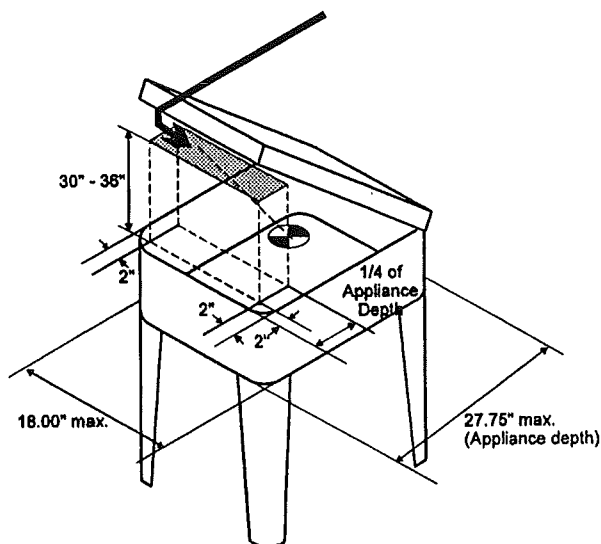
Model NL-F2 Nozzle Placement, Tilting Skillet/Braising Pan.
